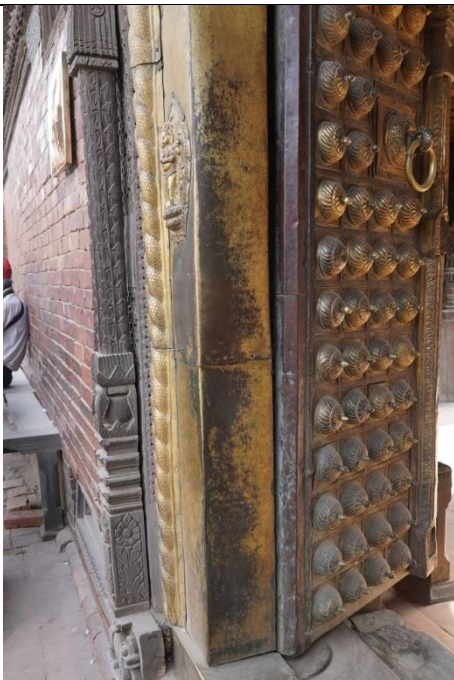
Abrasion/Worn out Gilding on the left door frame
